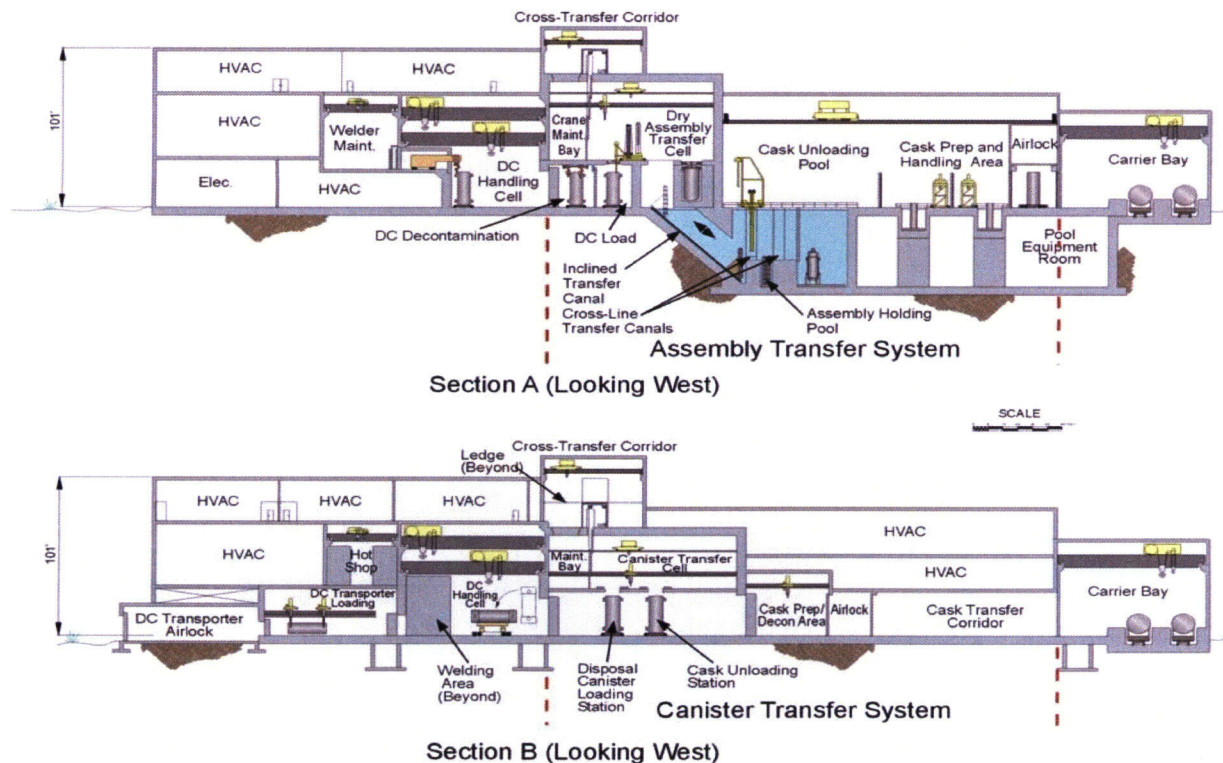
Sections A and B of Waste Handling Building (DOE, 2001b)
